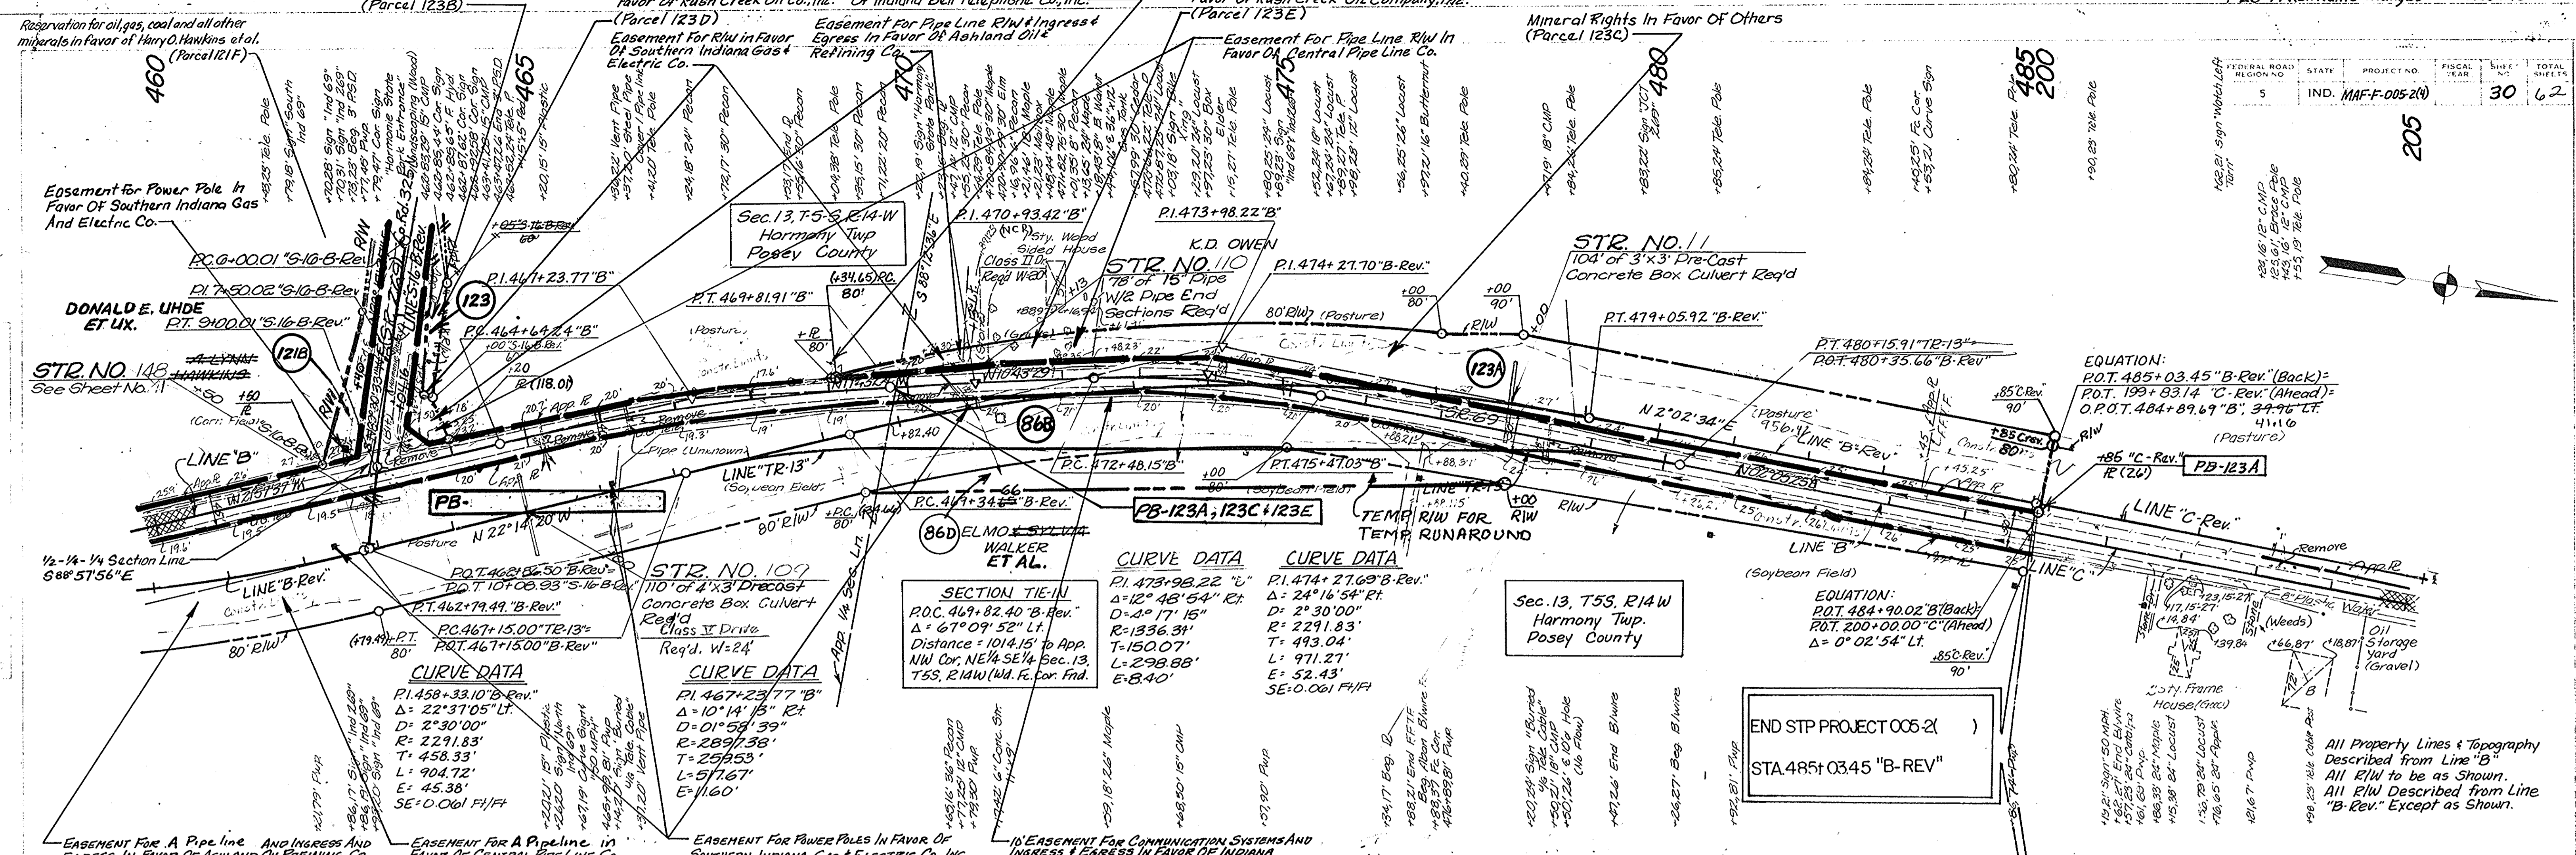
PLAN - PROFILE D. R. F. STANDARD 1975
